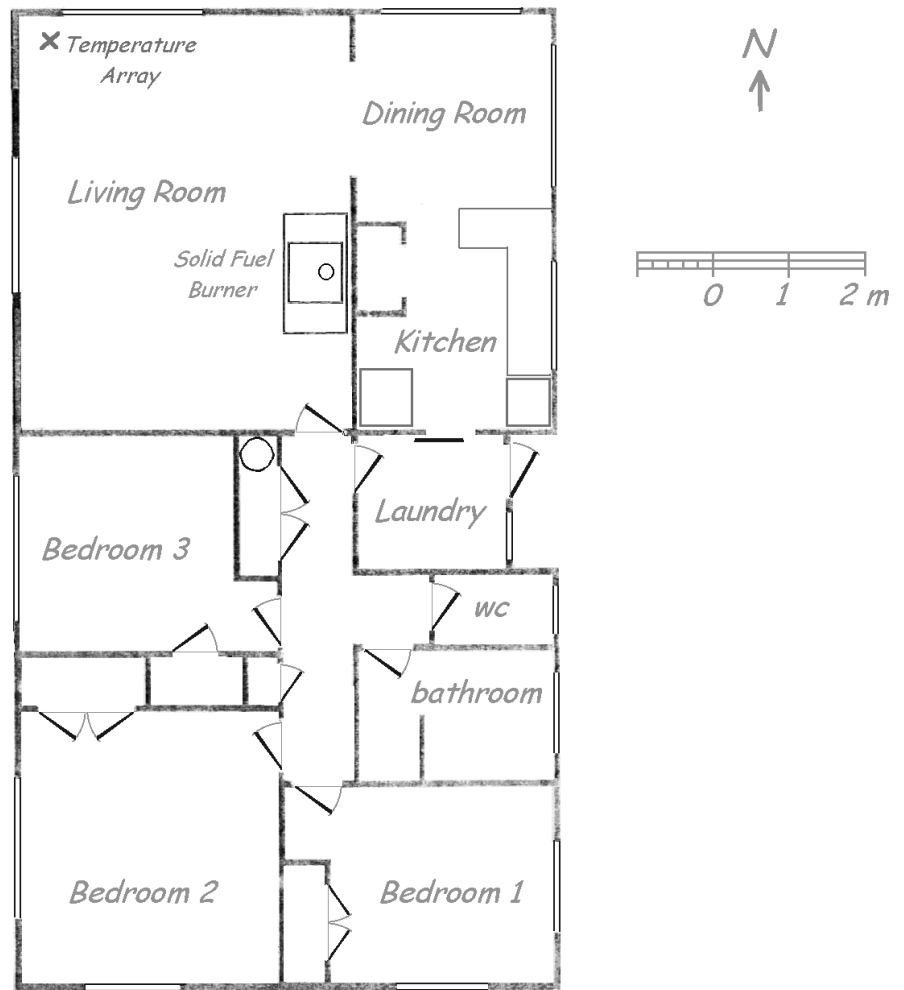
Floor plan of the Whitby house (scale 1:100)
